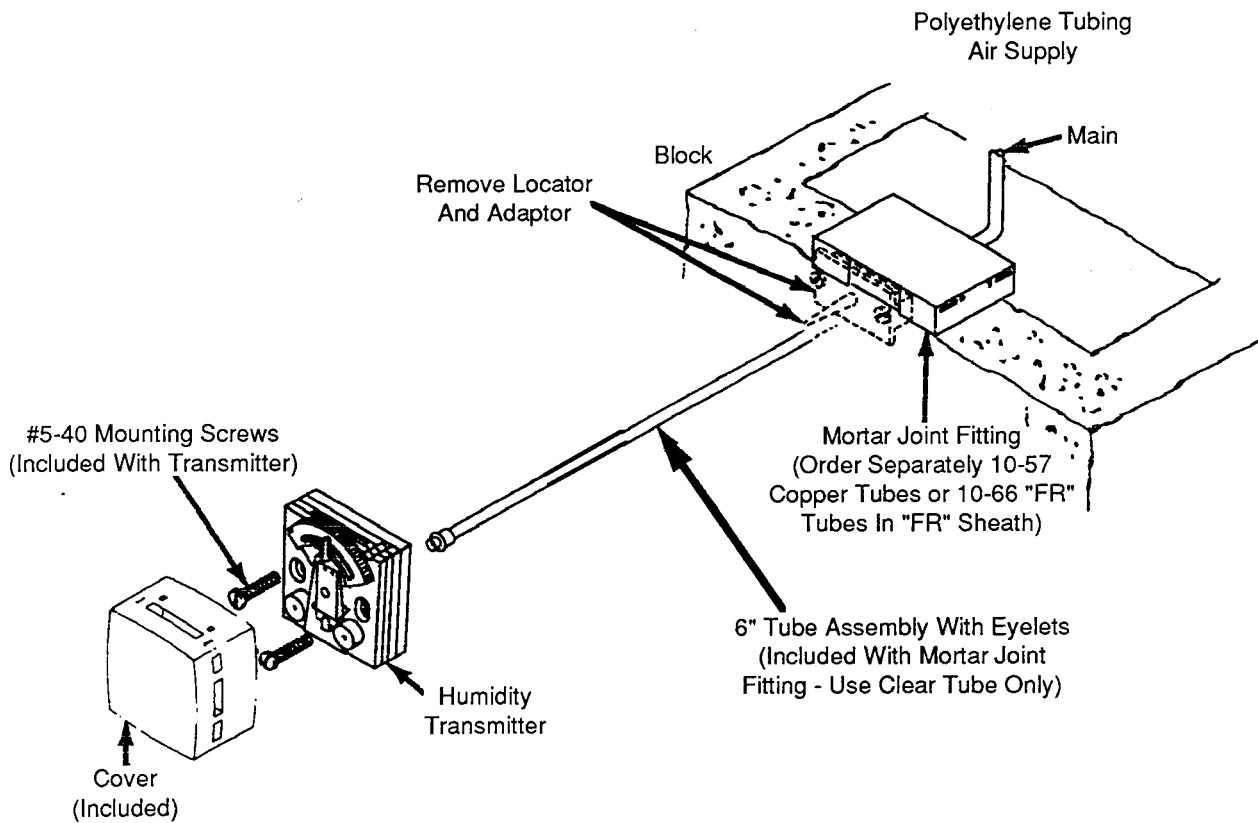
Typical Mortar Joint Fitting in Masonry Wall.
